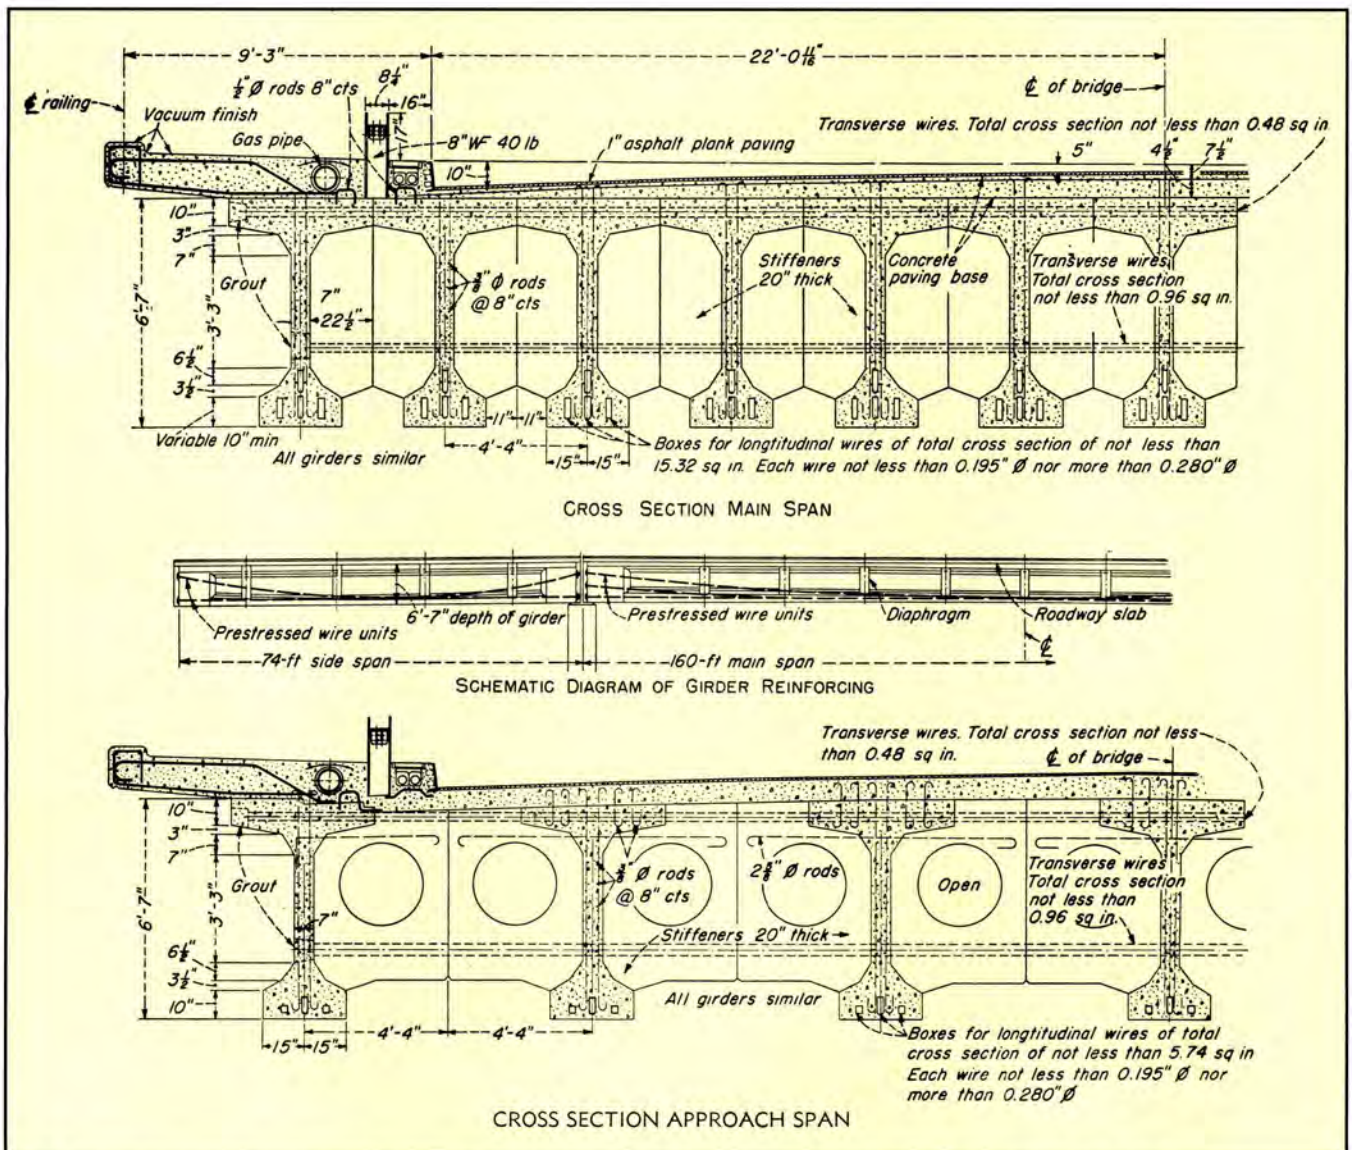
Cross sections of main and approach spans of the Walnut Lane Memorial Bridge. Diaphragms for the main span were cast with the girders; for the approach spans, diaphragms were cast continuous with the deck slab (diagram is borrowed from *Engineering News-Record*, December 30, 1948).
